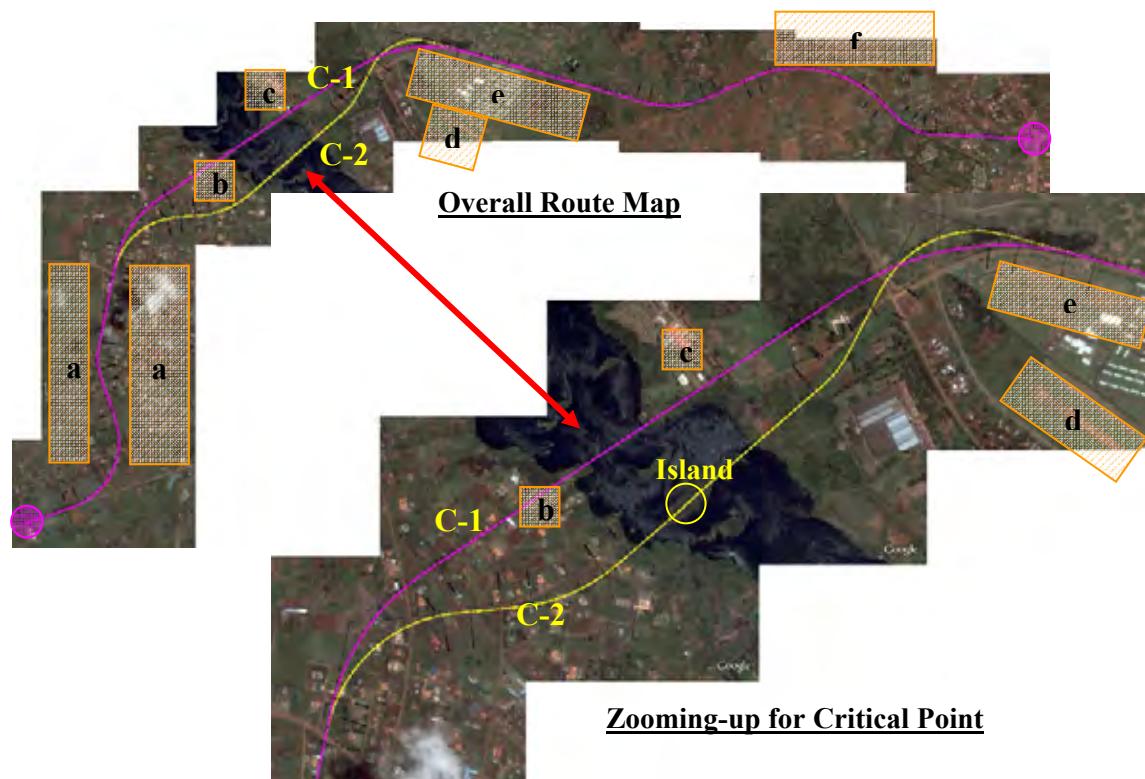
Alignment and Bridge Location of Alternatives C-1 and C-2
